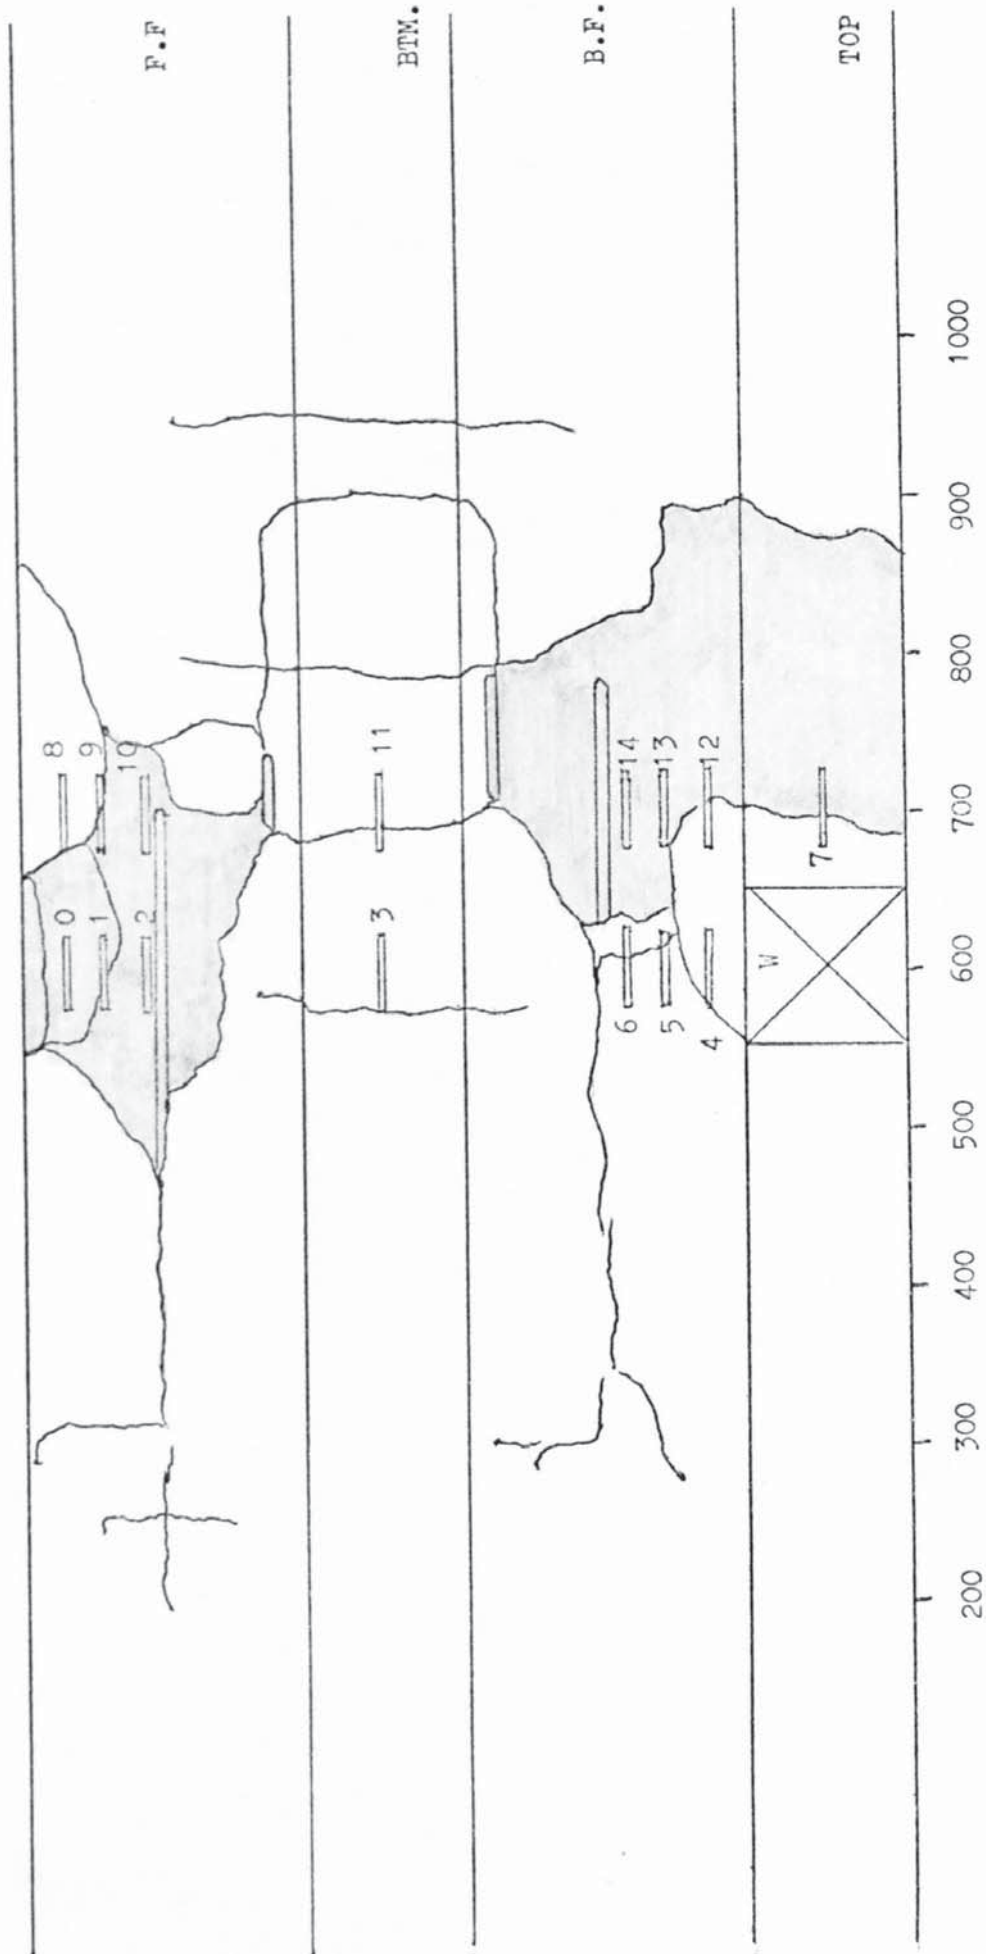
FAILURE CRACK PATTERNS - BEAM 26 ( MODE 1 )
